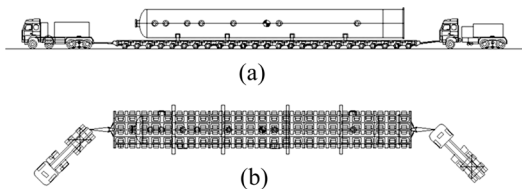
Extra heavy vehicle: (a) Elevation; (b) Plan
